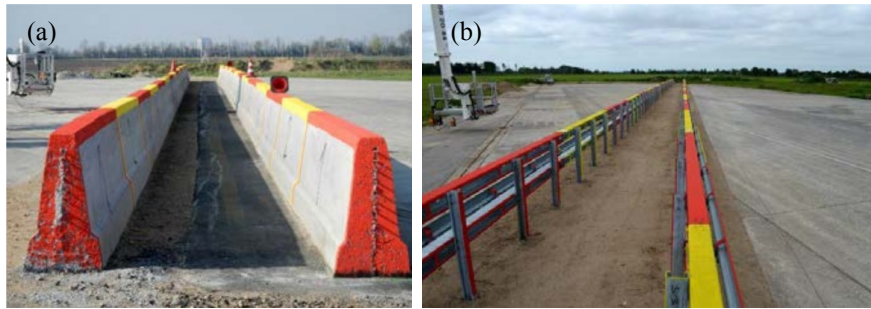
(a) concrete wall; (b) steel guardrail, both in double-row installation at test facility; figures published by Jungfeld, I. et al. (2017)
